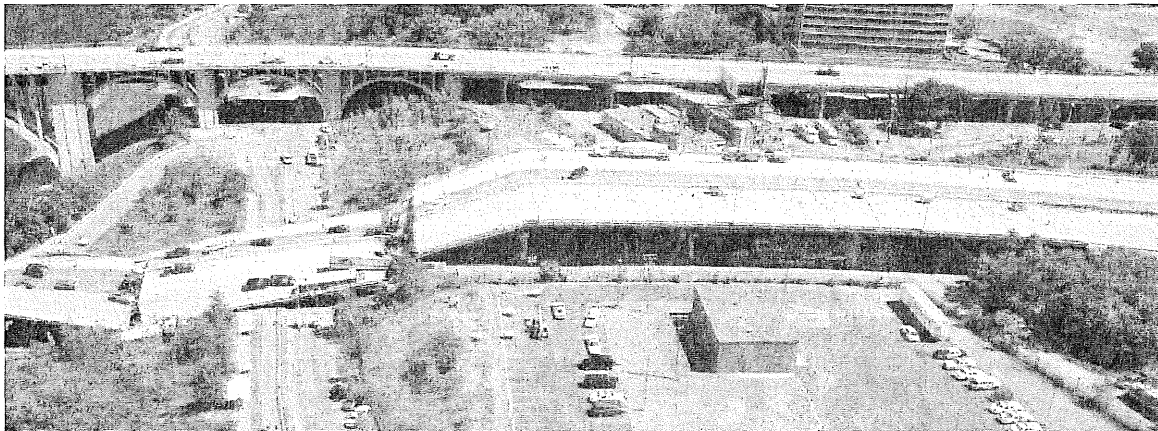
Post-collapse view of south approach spans looking southeast.
